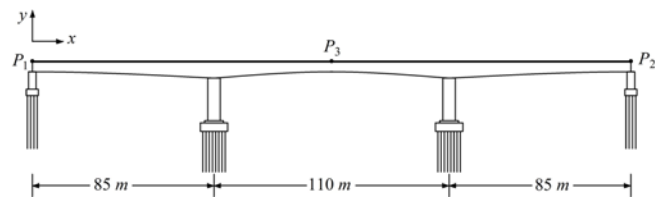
Model of the Three-Span Continuous Girder Bridge
